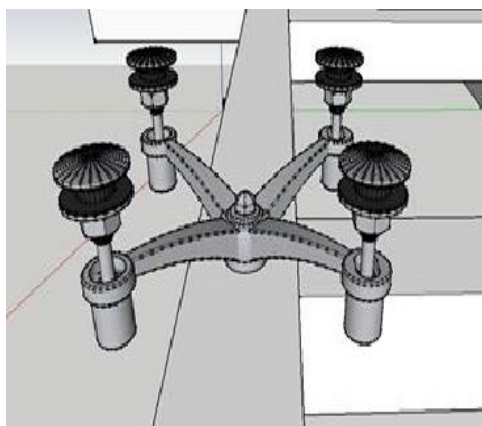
A sample of an augmented steel construction detail, produced by a student (Project 2)
